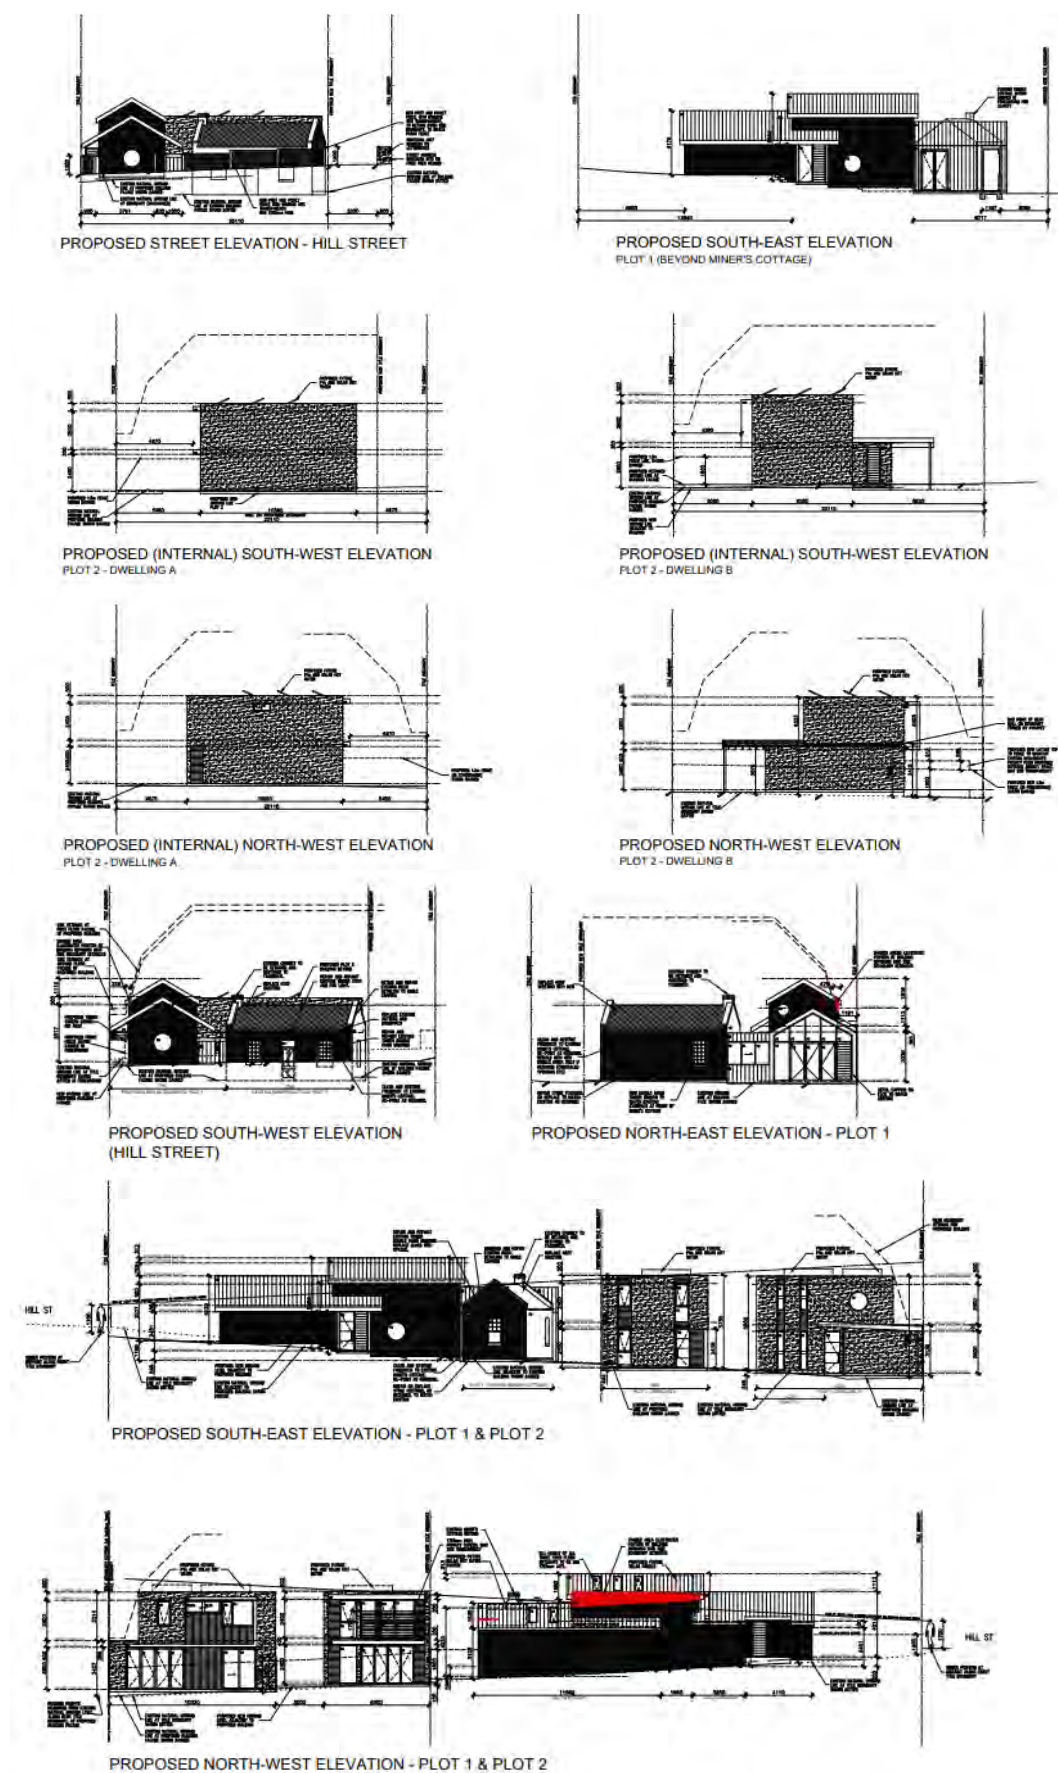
Previous application (DSD/110/2018) Proposed Elevation Plans
